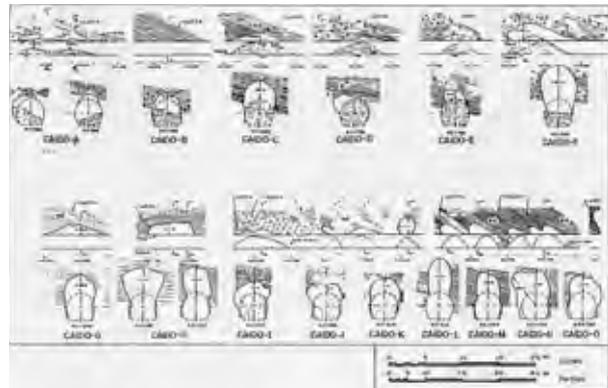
Cross sections of the slides A to O in the Chingaza tunnel
